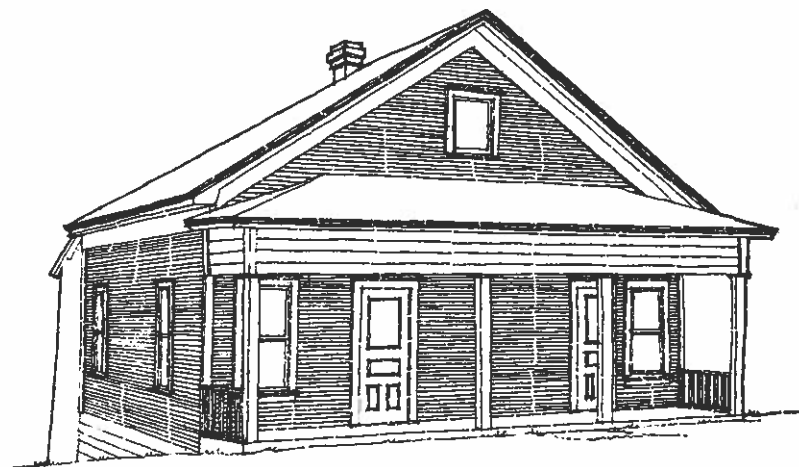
The Double Shotgun. After rehabilitation, this house has a rebuilt brick chimney, restored wood window, and wood siding above porch.
